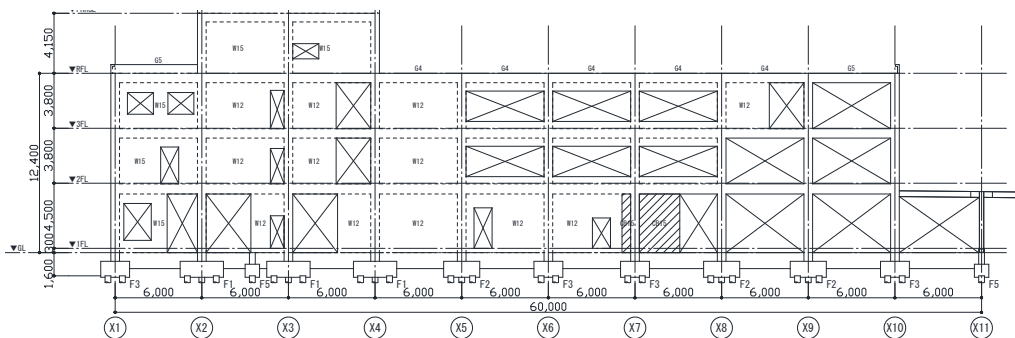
x-direction (east to west) Y3 frame structural elevation
